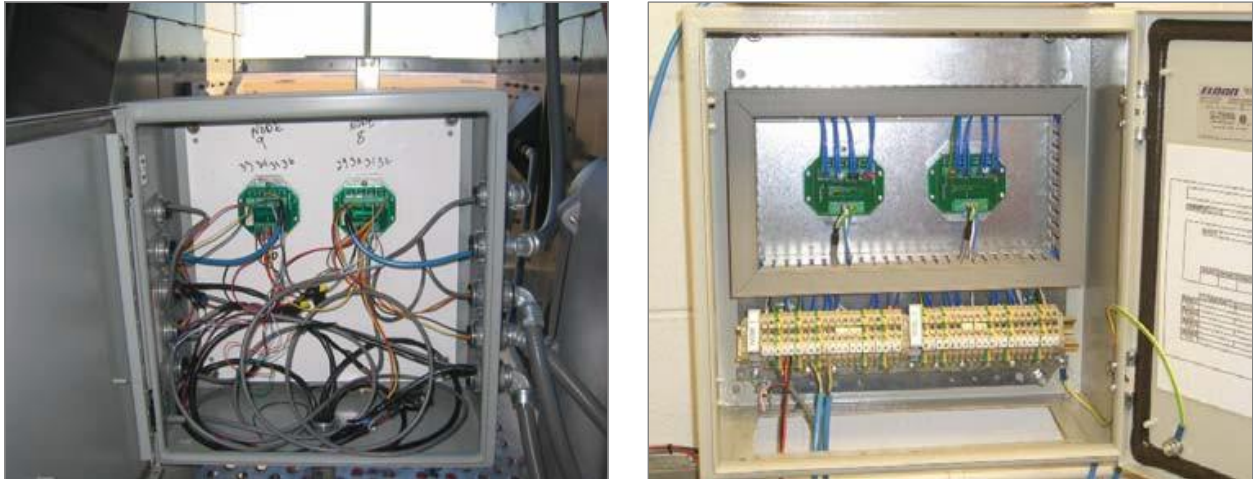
Poor wiring installation (left) and good wiring installation (right).
